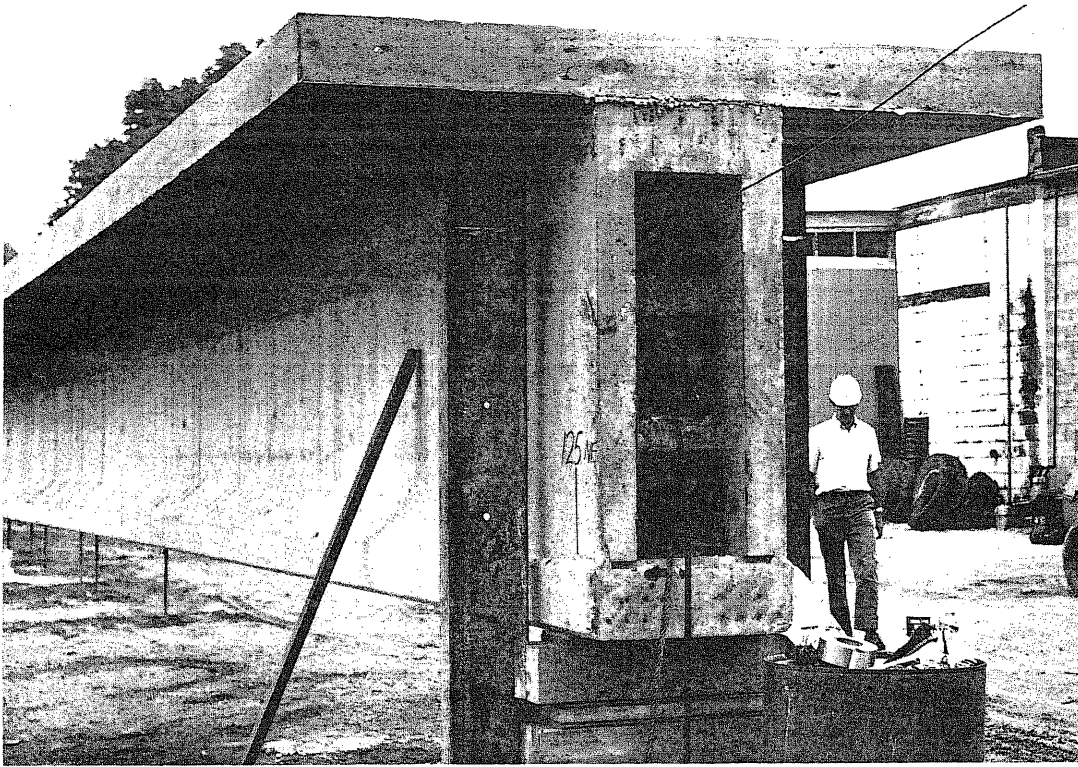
PHOTOGRAPH OF END OF BEAM SHOWING POST-TENSIONING ANCHORAGES
